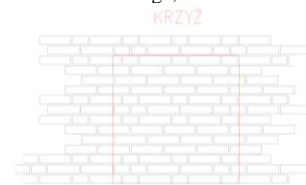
Proposal of arrangement of bricks in wall – named as “cross”
